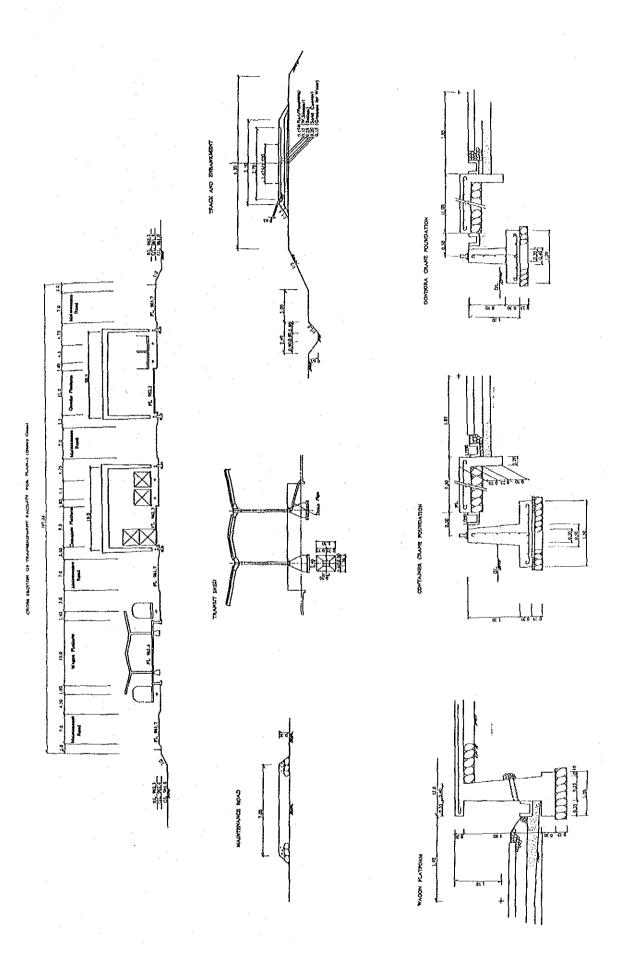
Preliminary Design Drawings of Civil Structure for Plan-1 (Gantry Crane)
